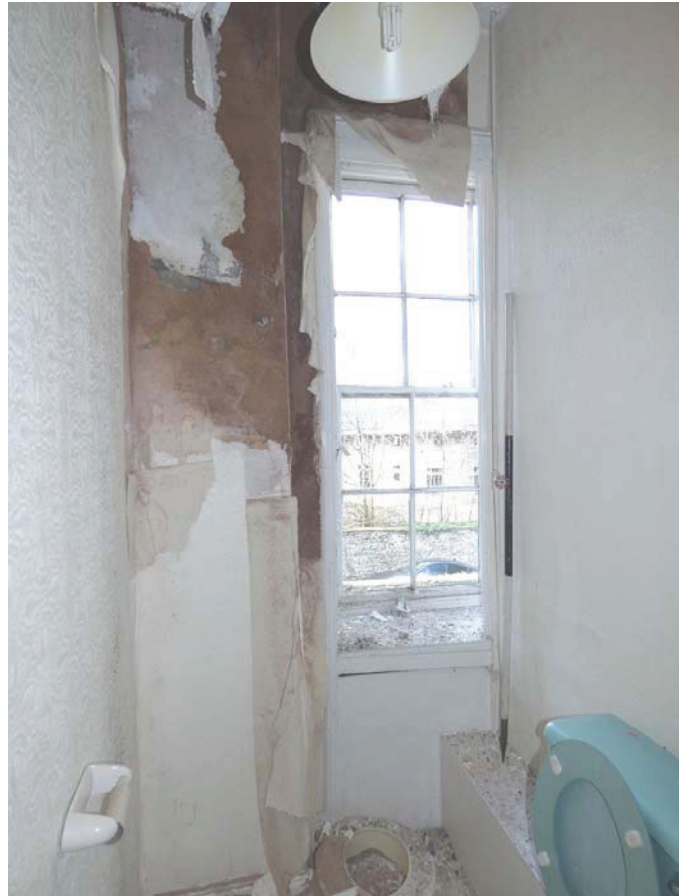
(right): Window to the north-west, Room F8, viewed from the south-east
